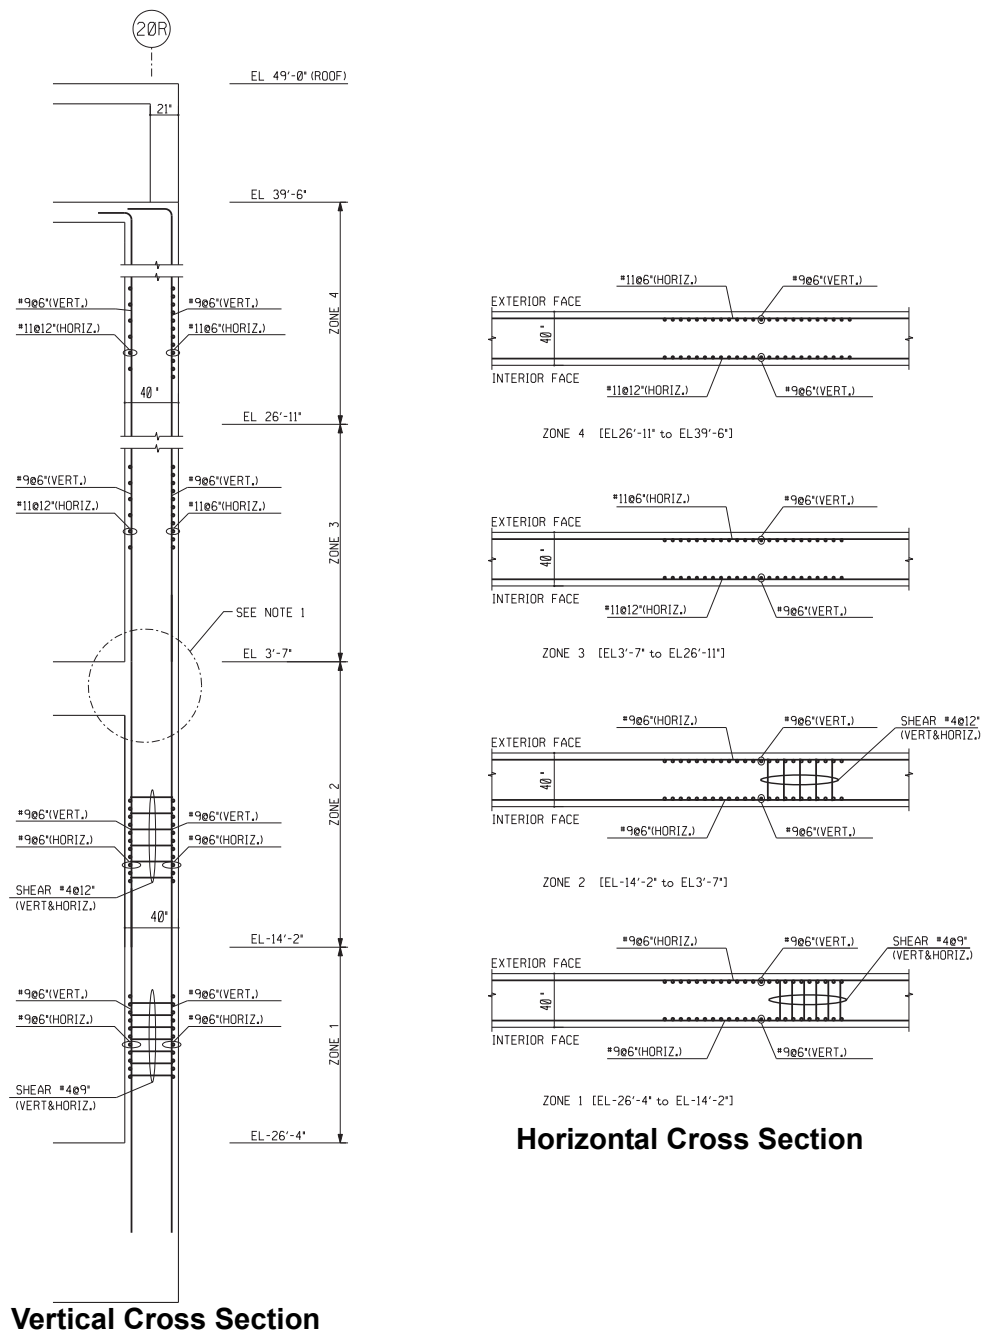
Typical Reinforcement in West PS/B North Wall – SECTION 3
